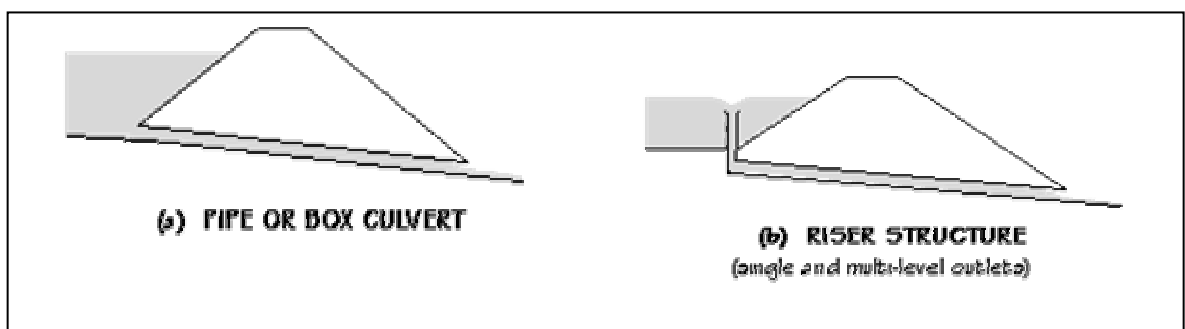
Typical Detention Pond Primary Outlets (DID, 2000)
